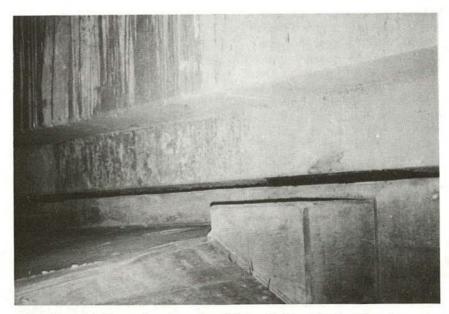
Jacking pad at abutment of Columbia River Bridge (1).
